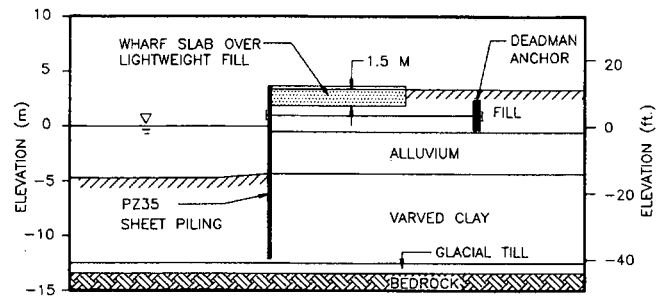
Lightweight fill placed to improve stability for wharf's sheet pile bulkhead.
